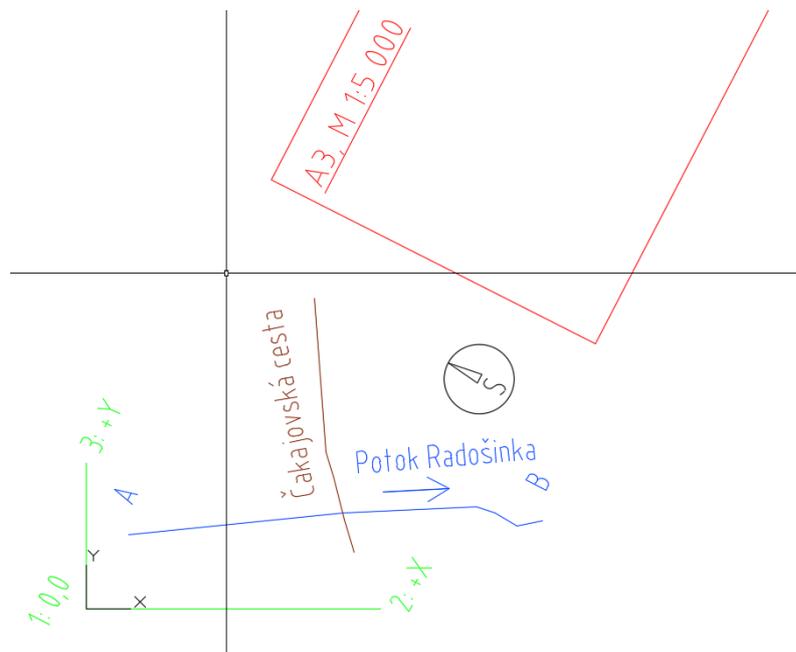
Drawing with the new coordinate system with the setting of a view perpendicular to the plane of the floor plan
